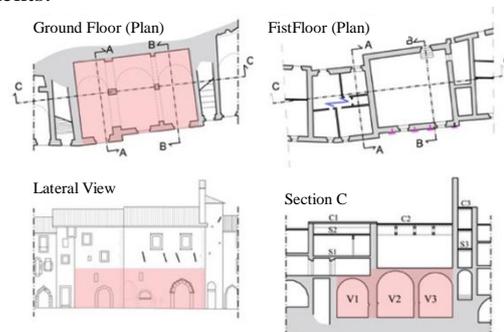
Plan, section and lateral view of the Church of St. Mary[10].
